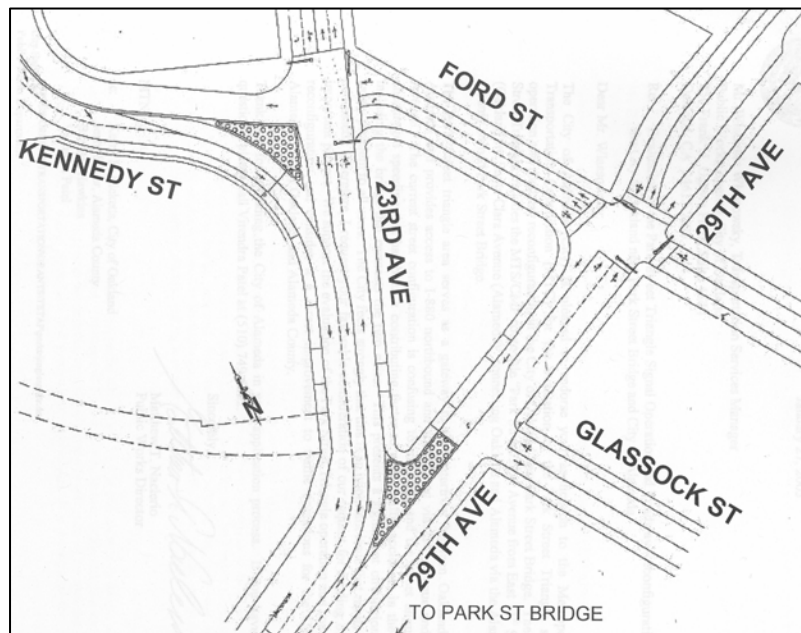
Plan for Alternative 1 and Alternative 2 – 23rd Avenue Closure
